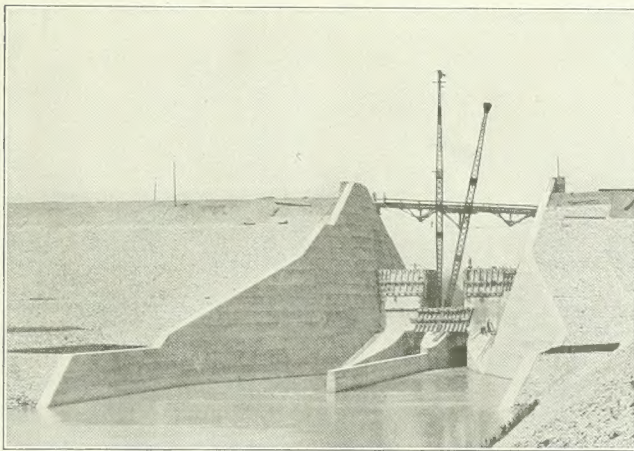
LOCKINGTON OUTLET STRUCTURE ON JULY 11, 1921.
